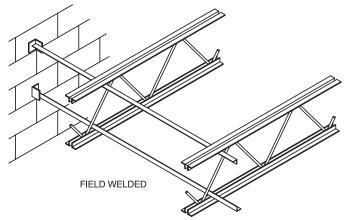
CANTILEVERED, BOTTOM BEARING, SQUARE END
